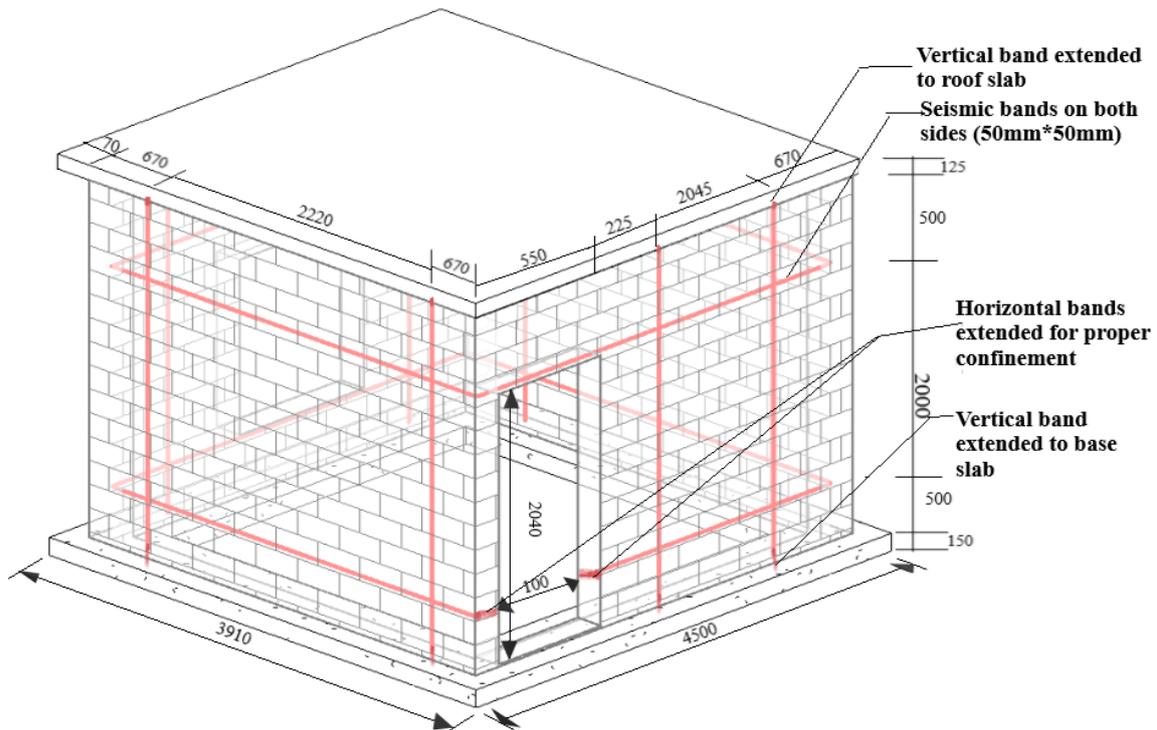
Schematic diagram of S\_URBM specimen with horizontal and vertical seismic bands at strategic locations (All dimensions in mm)
